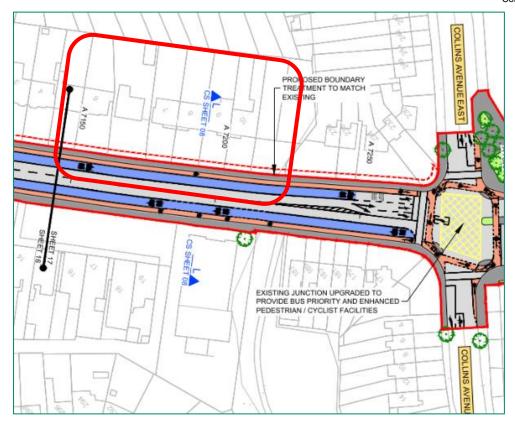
Proposed new Layout at 5, 6, 6A,7,8, 9 10 Maypark, Malahide Road
